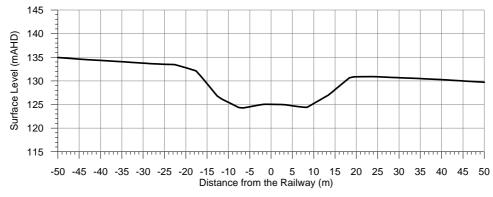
Cross-section through Cutting 75.3 km – Looking East (Up Track)
